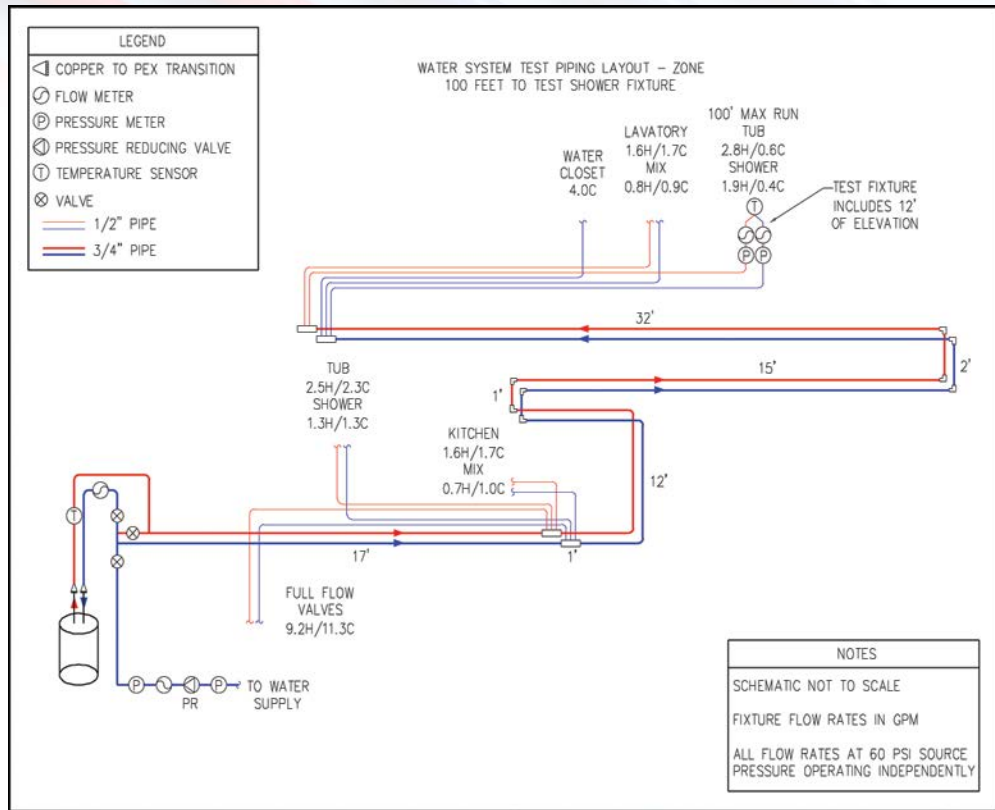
Water System Test Piping Layout – Zone, 100' to TF
